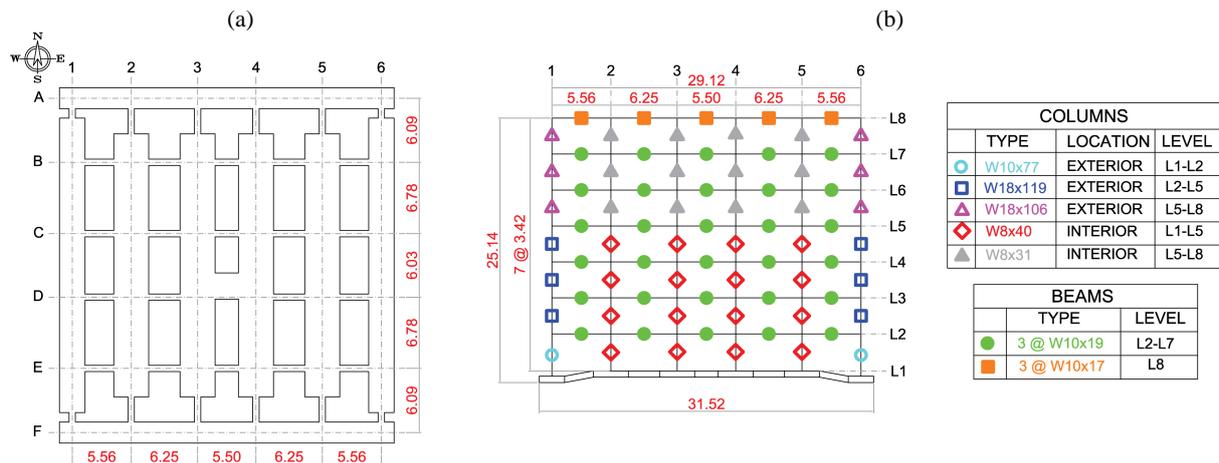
(a) Foundation plan view and (b) Structure's elevation view for lines B to E
